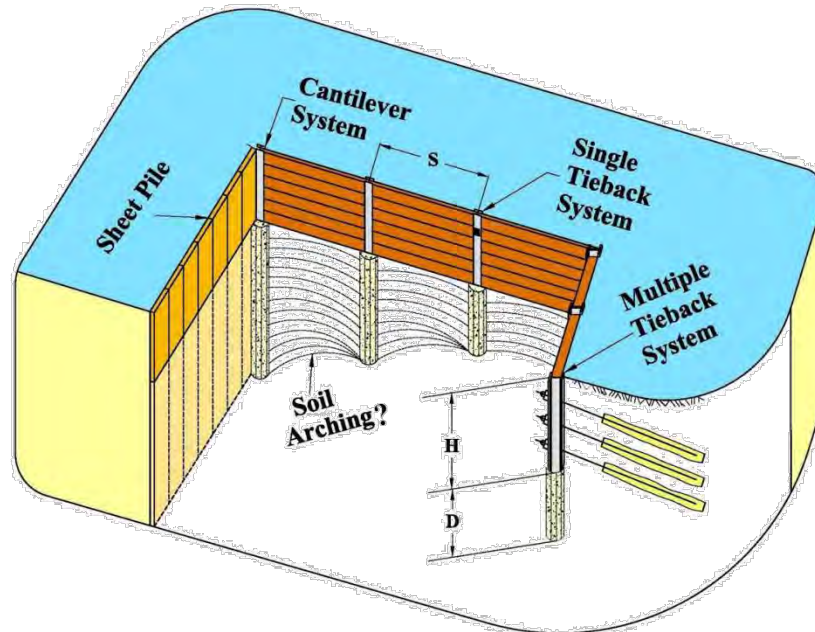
Cantilevered and Anchored Earth Retaining Systems
